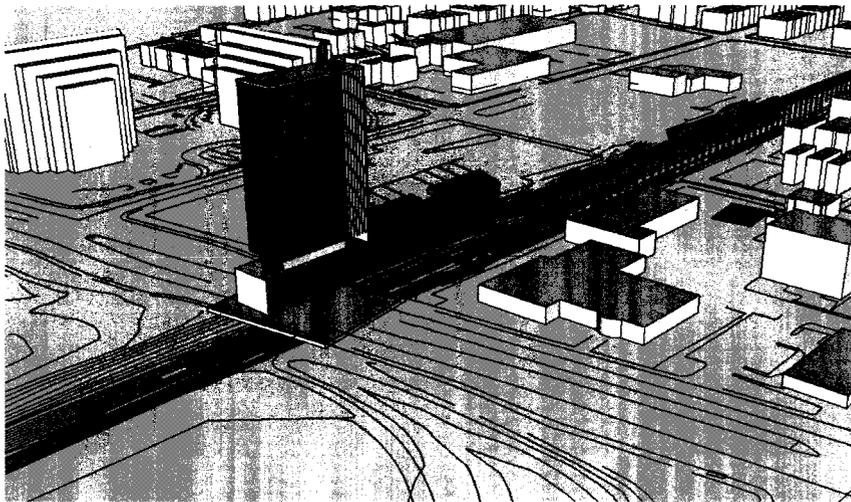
Carling Avenue Residential Tower looking Northwest. This image shows clearly how the tower will use the parallel right of way space above the O-Train Line corridor and the vertical space above Carling Avenue. The tower itself will be mainly residential, with some light commercial or entertainment spaces in the base of the tower – a restaurant would be ideal here, to take advantage of the site lines into Dow's Lake and parkland to the southeast (lower portion of the image). The horizontal section of the tower which follows the corridor and eventually connects with the elevated bike pathway would be completely for residential units with access to variable covered green spaces on the roof deck.
